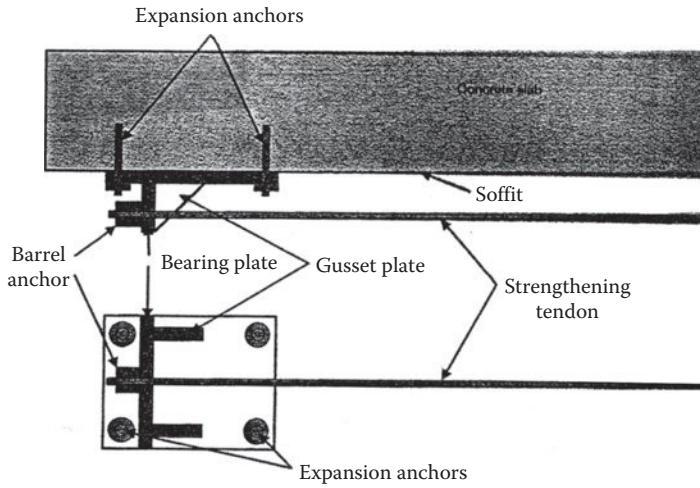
Anchorage device for single strand strengthening tendon.
